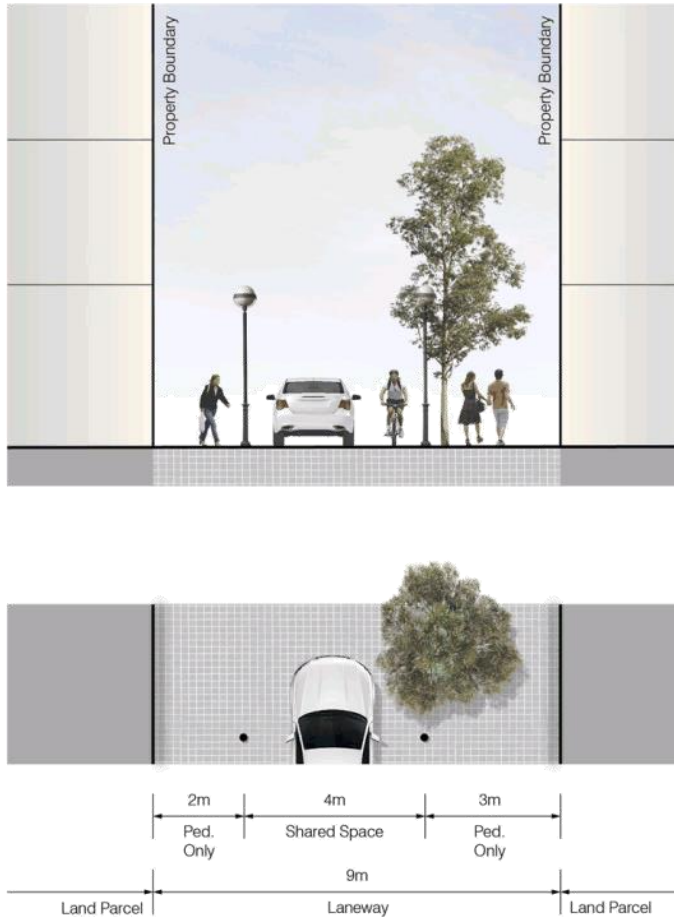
One-way Laneway Section - Connection to Nepean Highway
